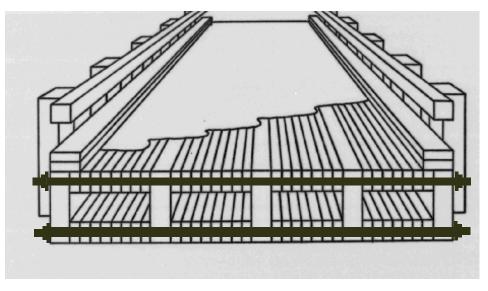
Typical Section of a Stress-Laminated Timber Box Beam (Source: Barry Dickson, West Virginia University)
